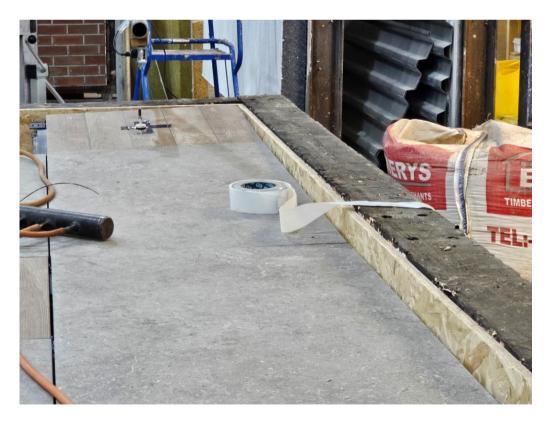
Tiles Lifting During Load Testing of A-PED-JOIST Section
